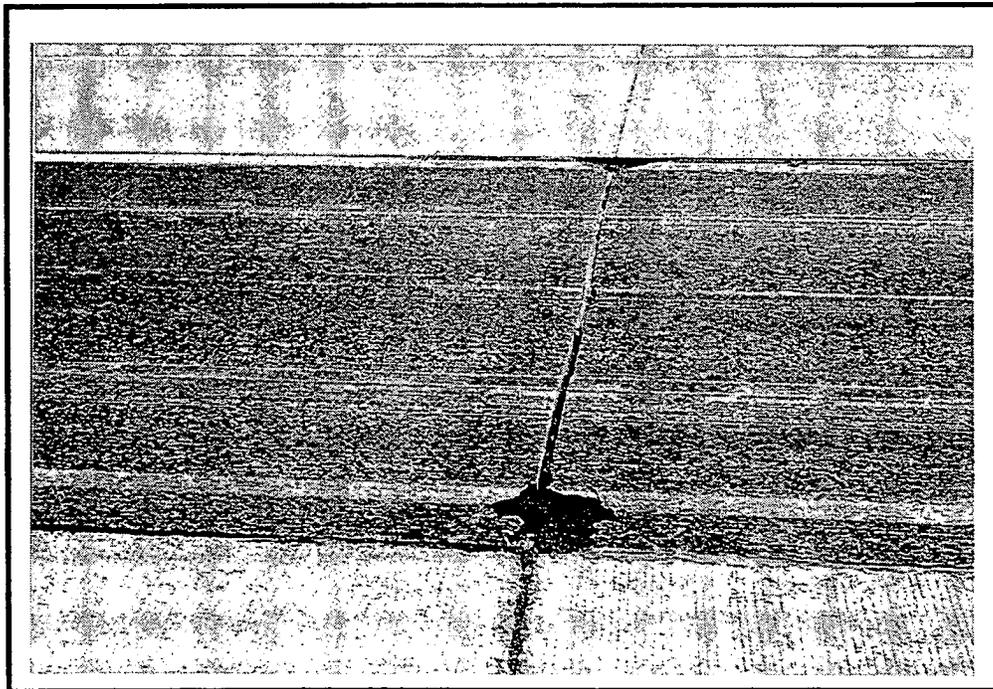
Joint Sealant Damage in Jointed Concrete Pavement
